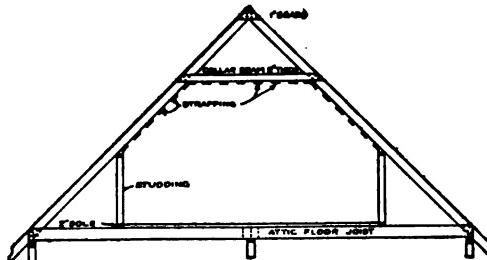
Pitched Roof Strengthened by Collar-Beams.
